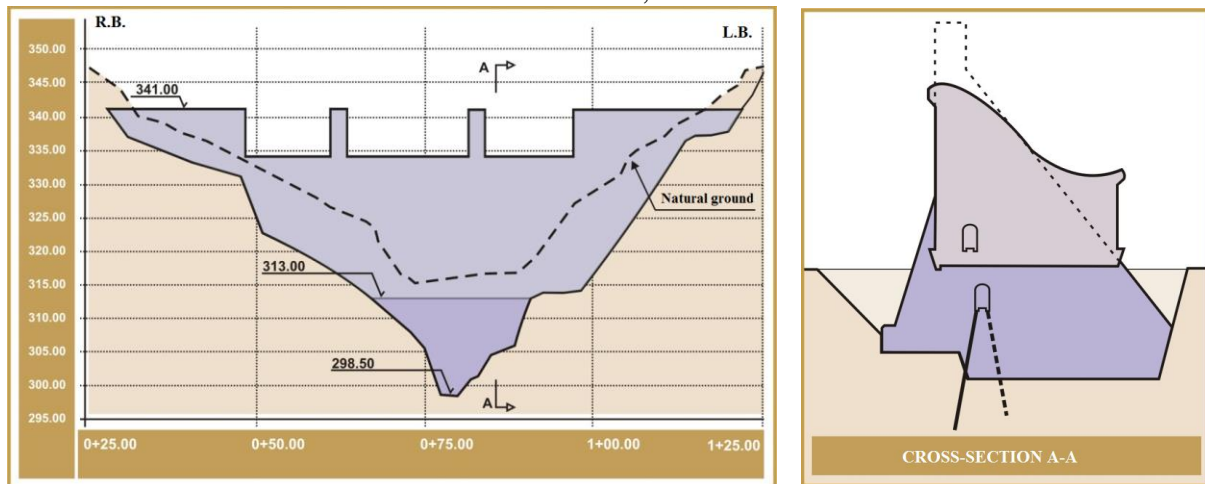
Bouçoais-Sonim dam. Schematic longitudinal profile and cross-section
